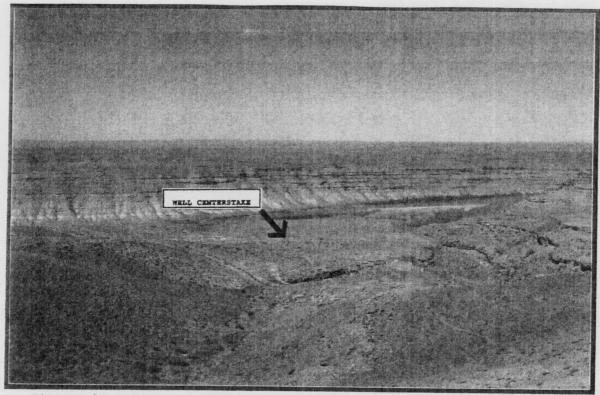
View to west at the proposed RBU #13-17E centerstake and well pad area.
